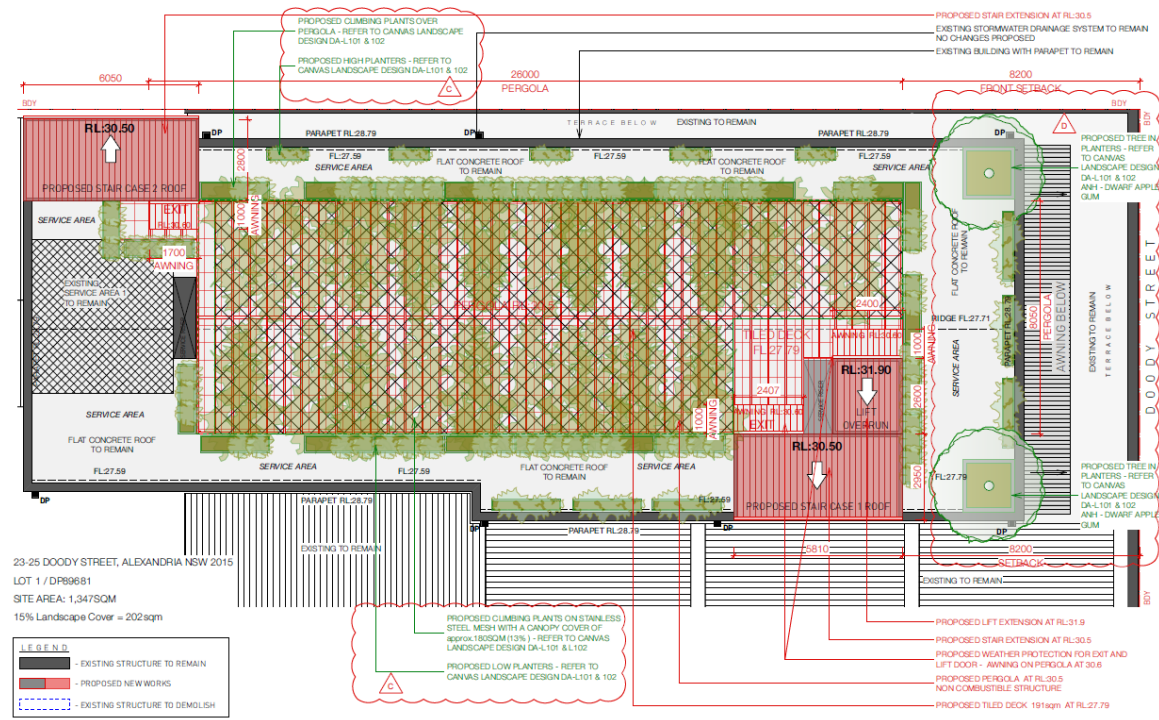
Proposed Roof Plan demonstrating the proposed extension of the lift and fire stairs including roof over, proposed pergola structures and associated landscaping
